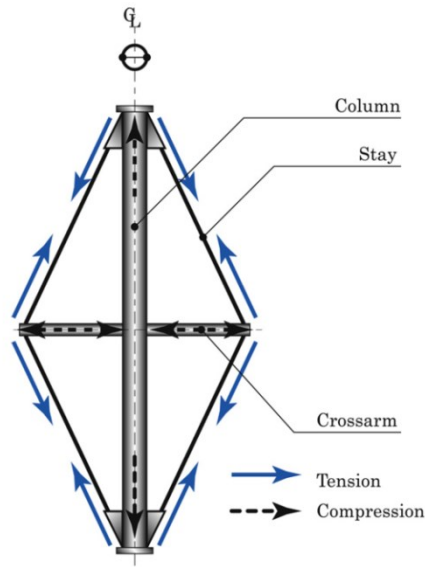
Prestressed stayed column system with a single cross-arm (Saito and Wadee, 2009).
